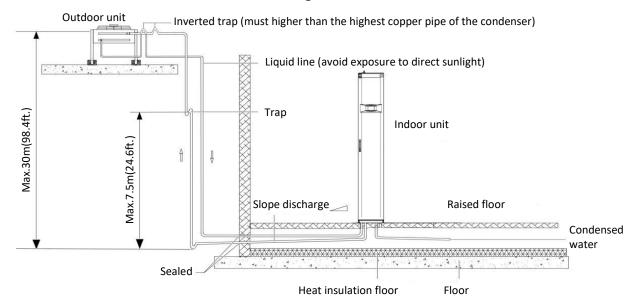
Condenser is Placed Higher than the Compressors during Installation
